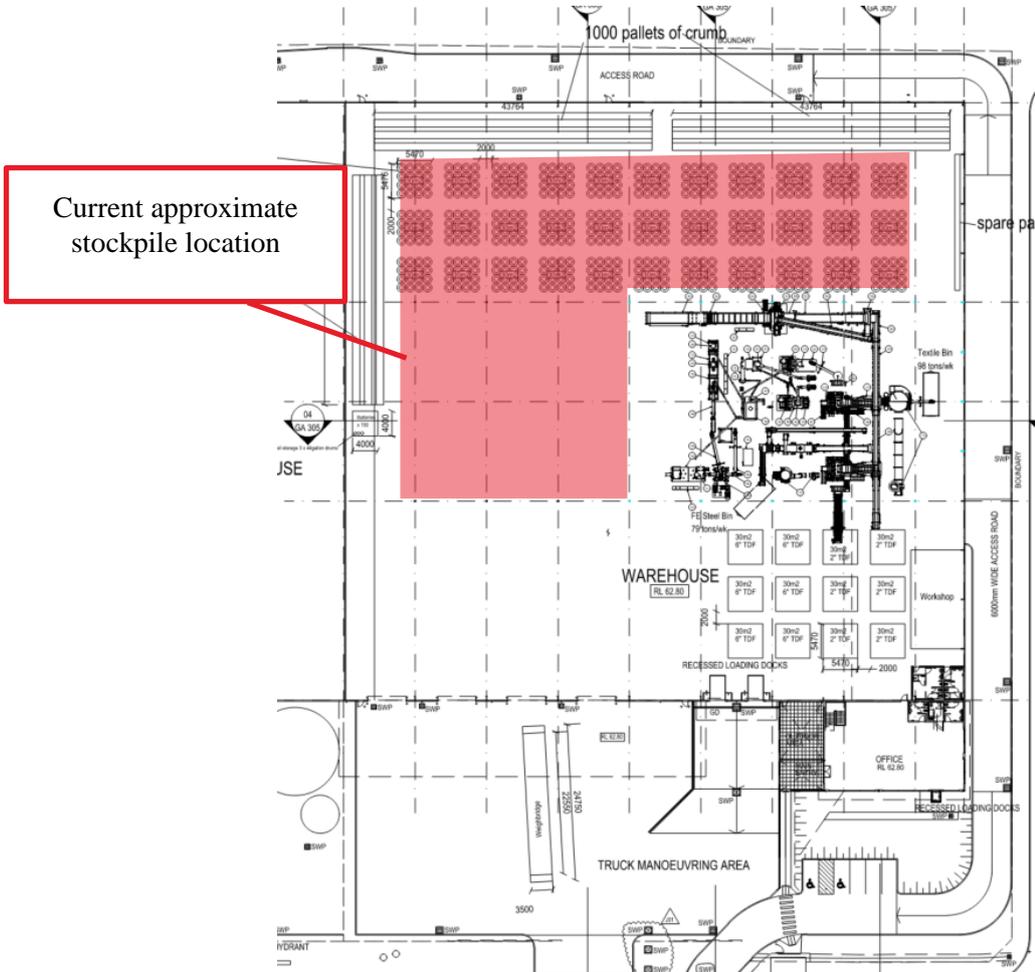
Current Site Layout – Truck tyre stockpile (only indicative for current arrangement)
